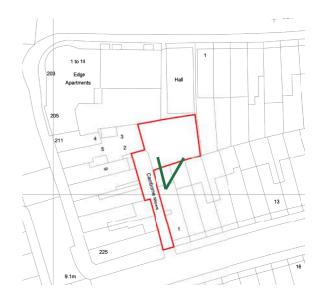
VIEW FROM CAMBORNE ROAD -BUILDING OUTLINE IN RED
